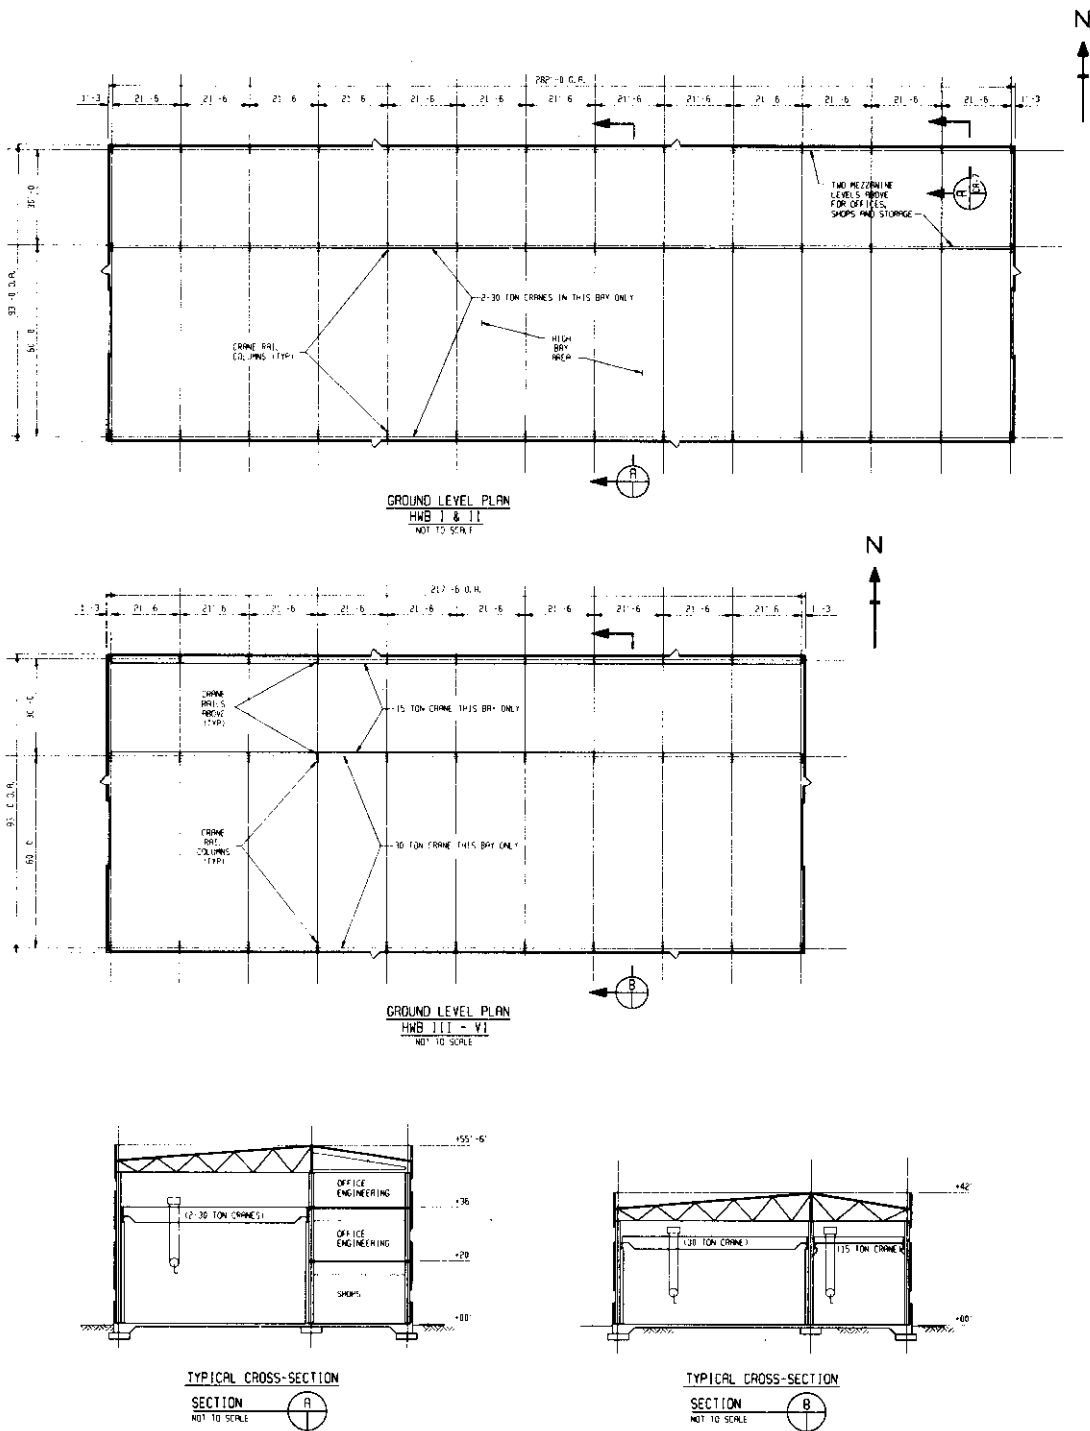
Floor plan for large Heavy Works Building showing main floor and mezzanine floor plans.
